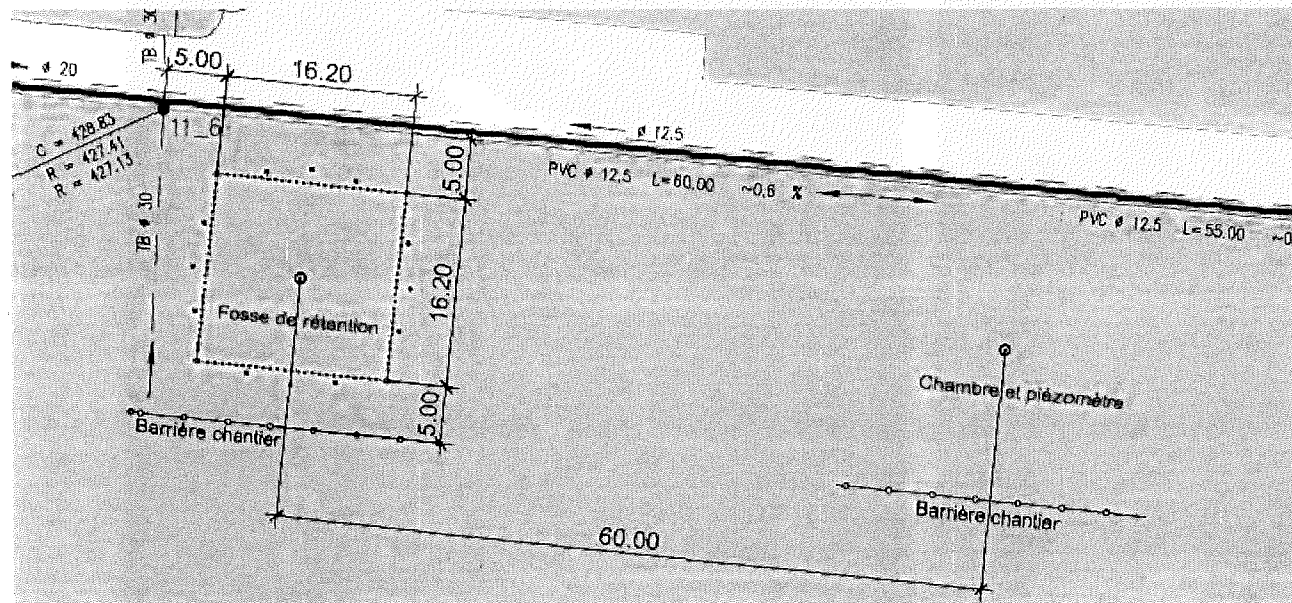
Test study layout adjacent to taxiway at GIA (GADZ 2014).
